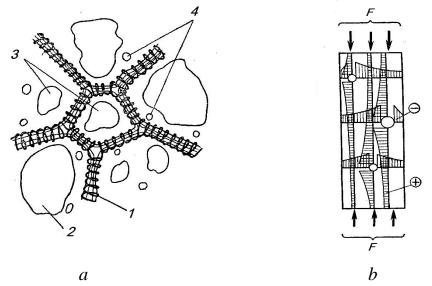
The structure of concrete (a) and the stress state of the compressed concrete sample (b): 1 - cement stone; 2 - crushed stone; 3 - sand; 4 - pores, which contain air and water
